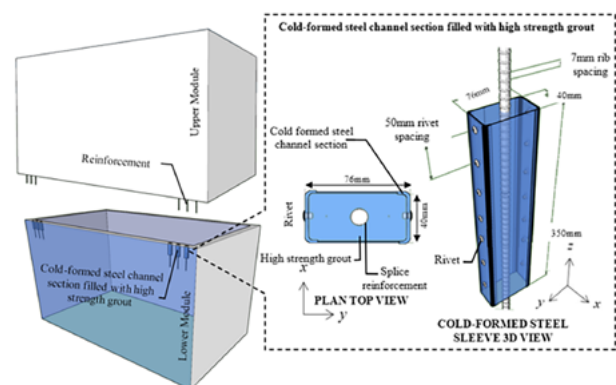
Structural components in proposed grouted sleeve connection in reinforced concrete walls of modular building
